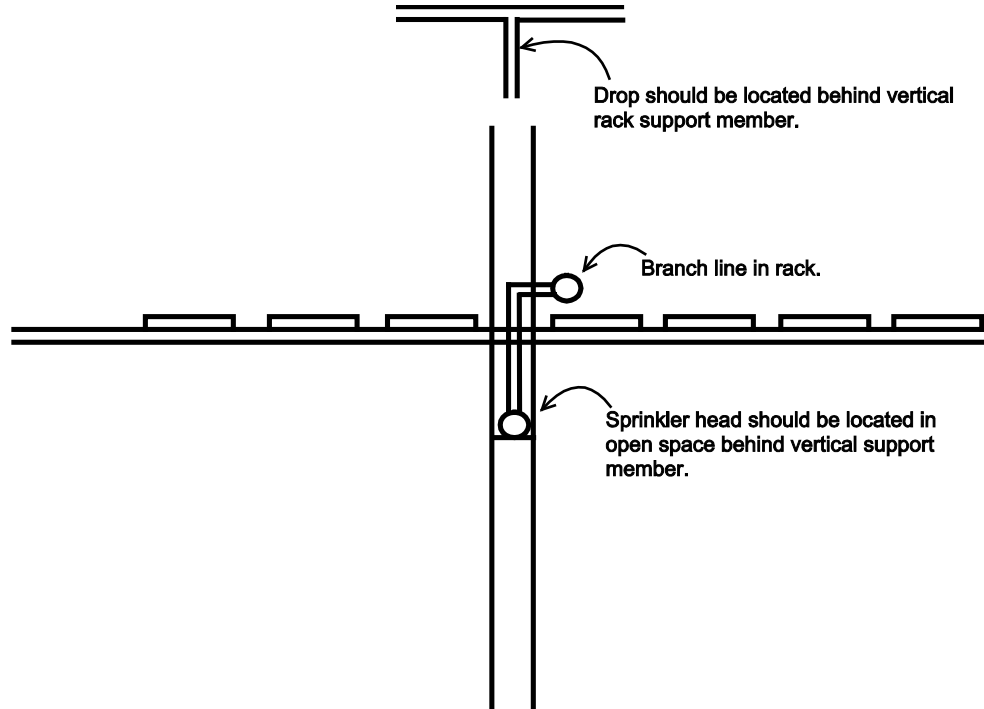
Rack Sprinkler Installation With No Fire Stops or Bulkheads.
